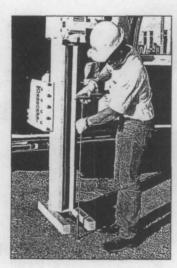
Extension Rods are rotated clockwise to release the MC Piston assembly.
